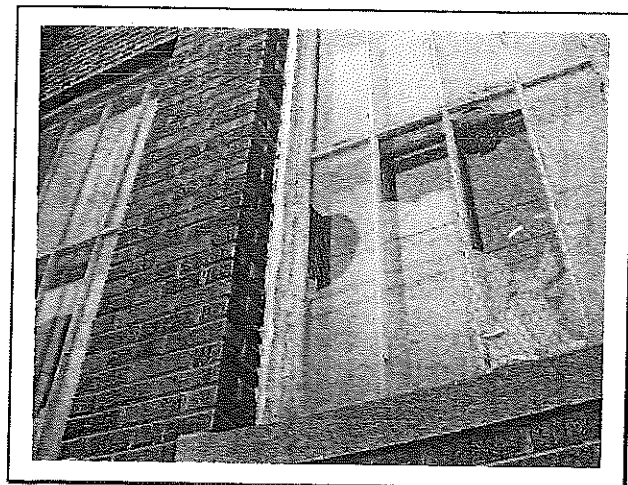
Viewing asbestos-containing white window caulking, Exterior.
